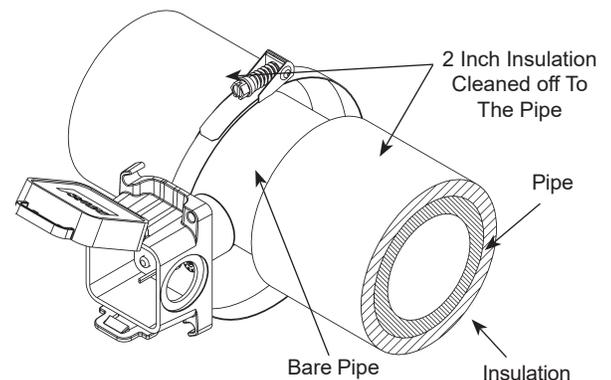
Clamp-On Strap with BAPI-Box Crossover Enclosure installation
